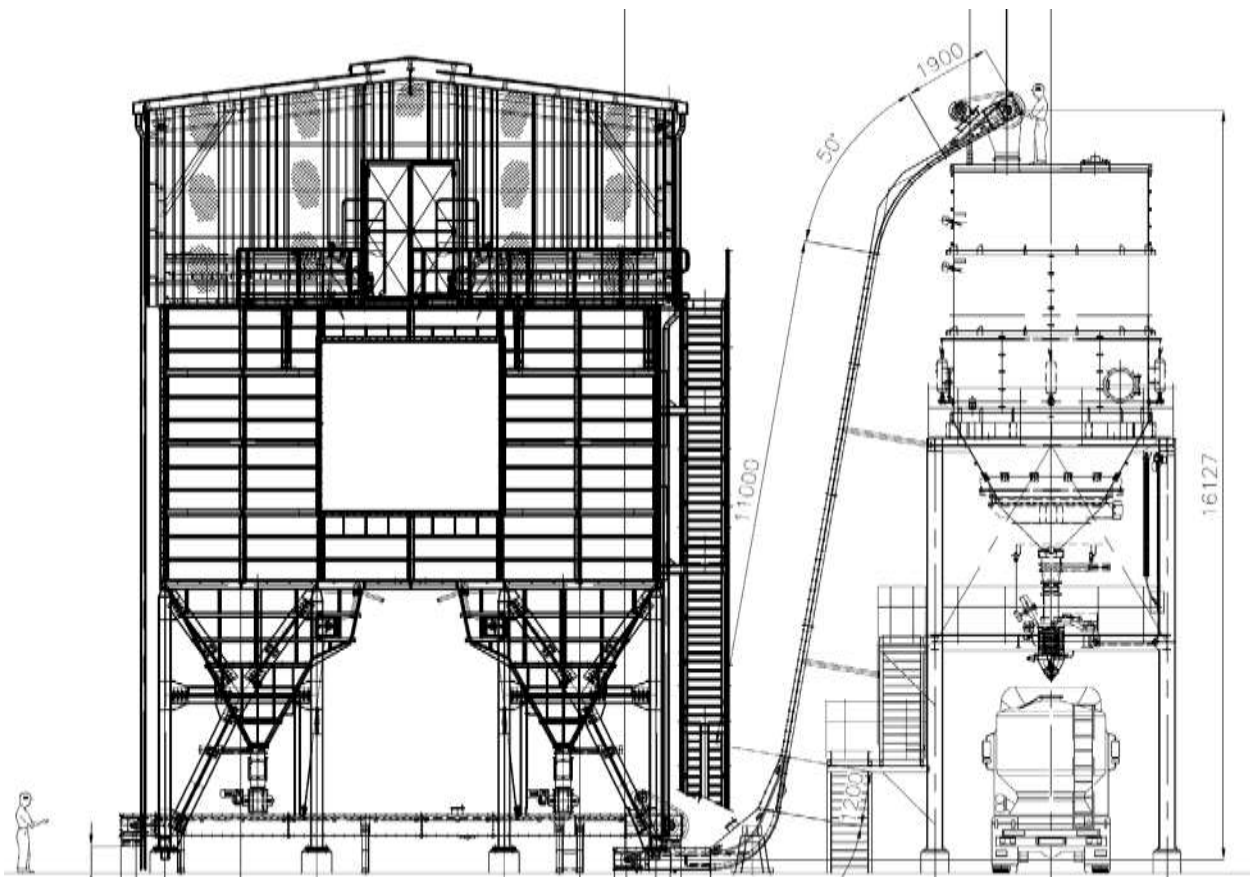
elevation view of the baghouse and dust handling equipment
